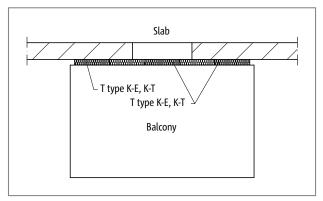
Schöck Isokorb® T type K-E, K-T: Cantilevered balcony
